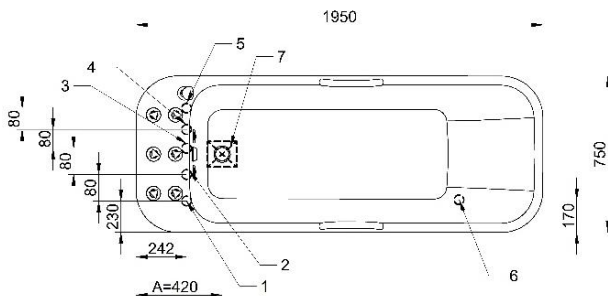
BALMED bathtub dimensions and layout of media outlets in the floor (dimensions in mm)
